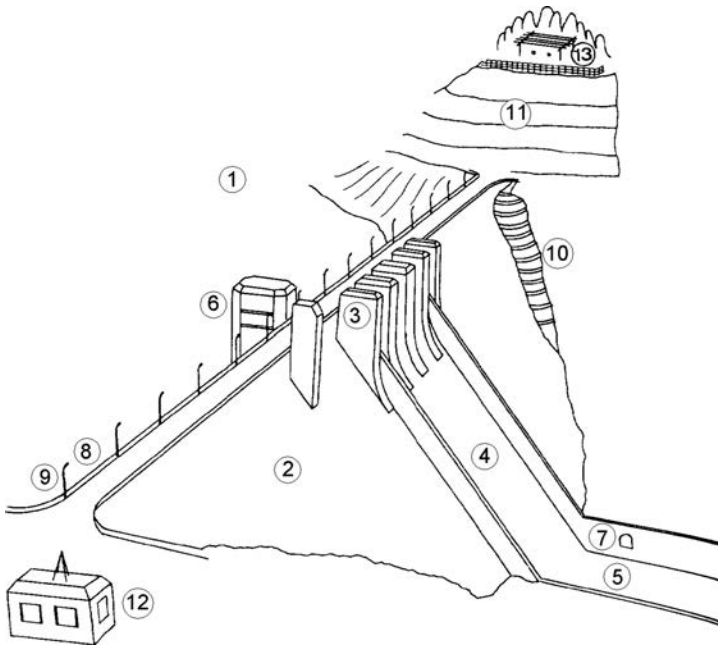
Aspects of aesthetic shaping of a hydraulic scheme with a concrete dam. (1) General view; (2) downstream side of the dam (without spillway); (3) training wall of the spillway; (4) spillway chute; (5) stilling basin; (6) intake structure; (7) conduit for water supply; (8) fence; (9) lighting devices and equipment; (10) step-like shaped rock; (11) slope of excavation and construction site for temporary works; (12) control house; (13) surveillance platform.
